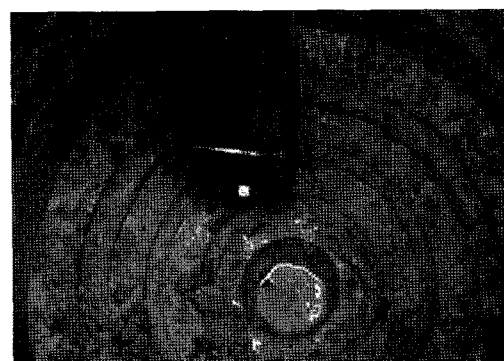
SRP at Bottom of Drilled Shaft Borehole
